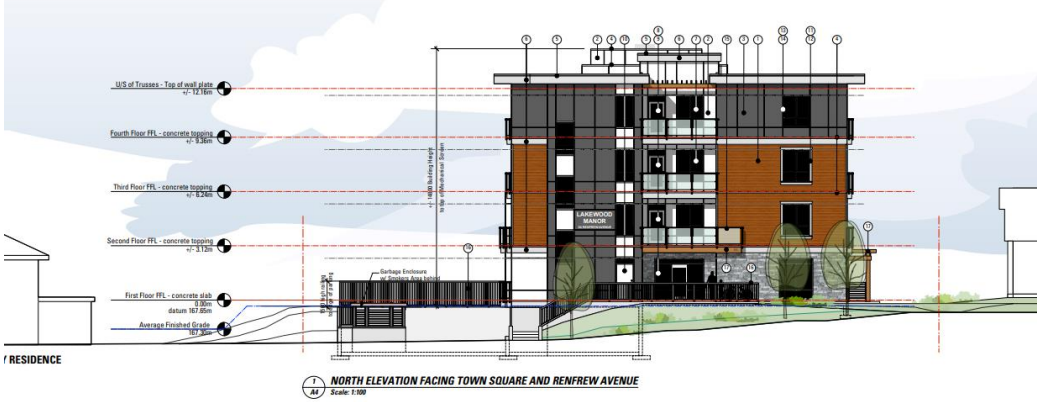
North Elevation Facing Town Square and Renfrew Avenue
